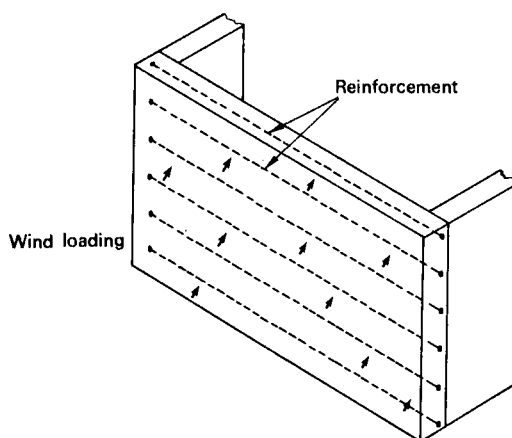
Laterally loaded reinforced brickwork panel with horizontal reinforcement in the bed joints.
